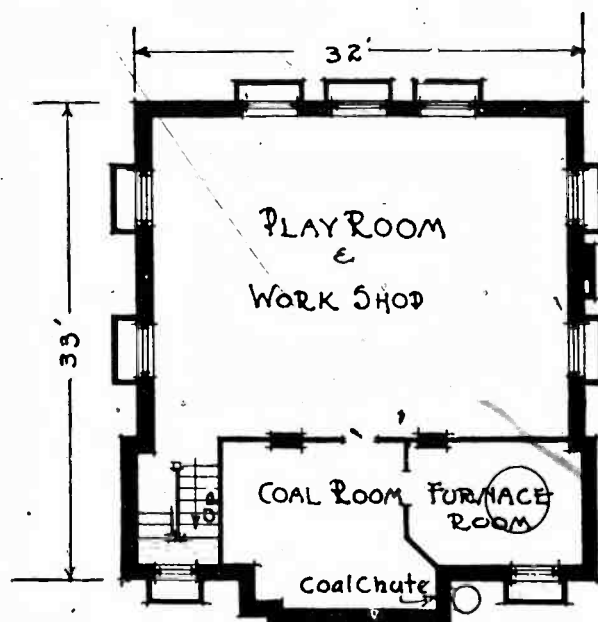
Basement plan, Crossroads School, Macon Co., Ill.
